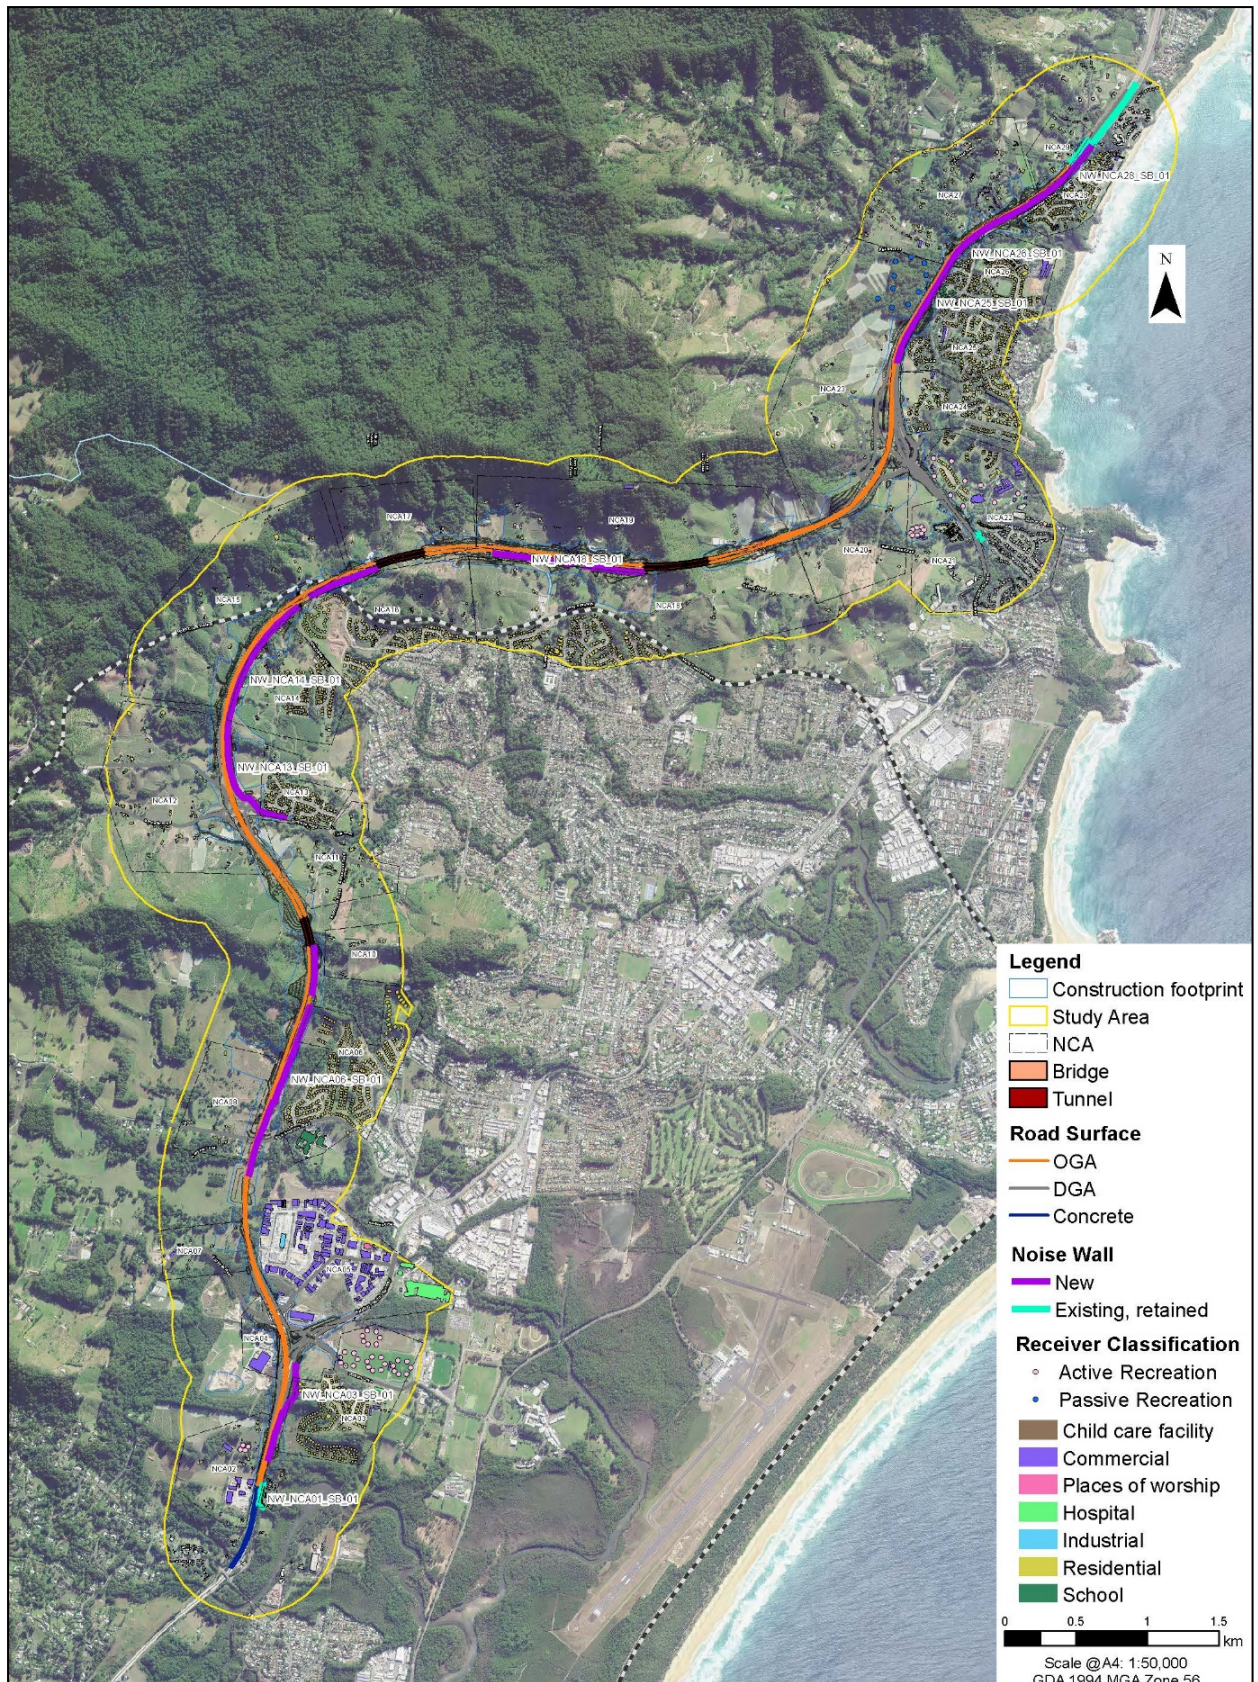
| Proposed locations of Noise Walls and low noise pavement (source: TfNSW)
